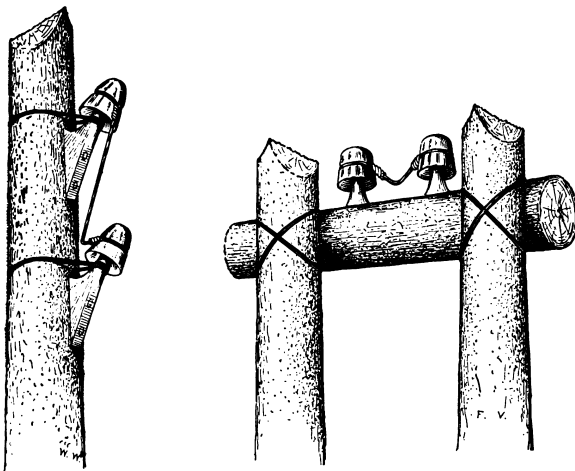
AERIAL LINE CONSTRUCTION, LONG SPANS, CONSTRUCTION OF SADDLES.
